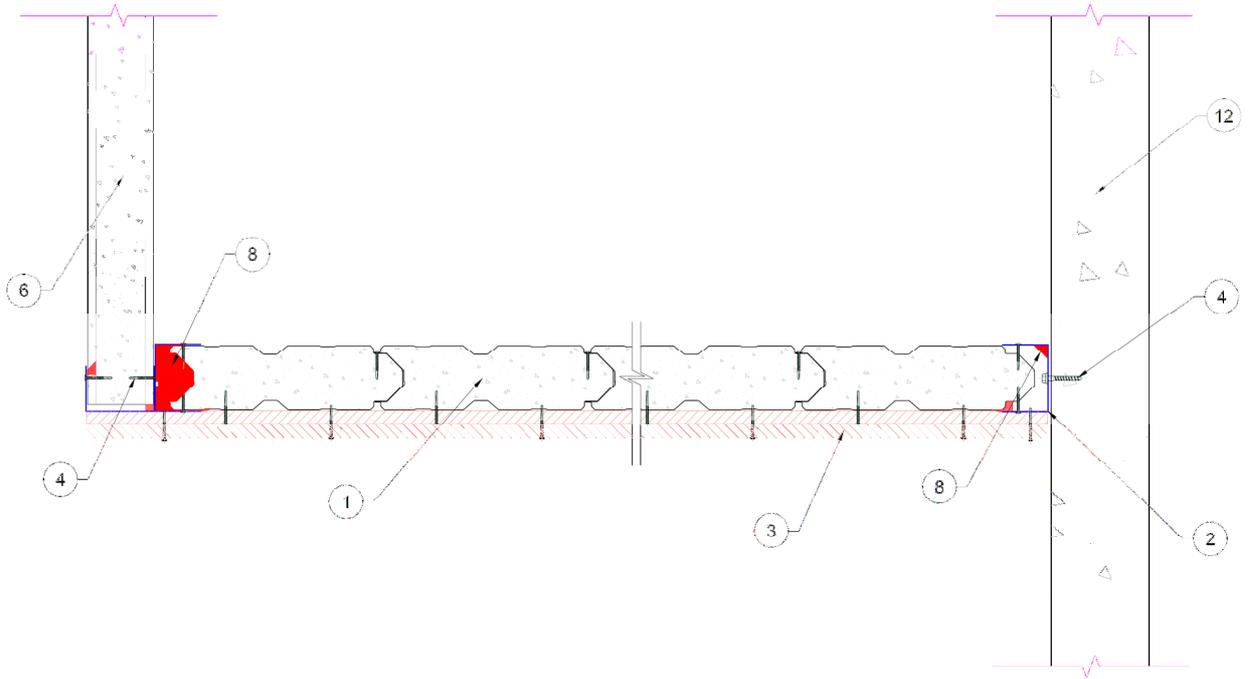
Speedpanel ceiling protected with plasterboard linings (Longitudinal Section View)
